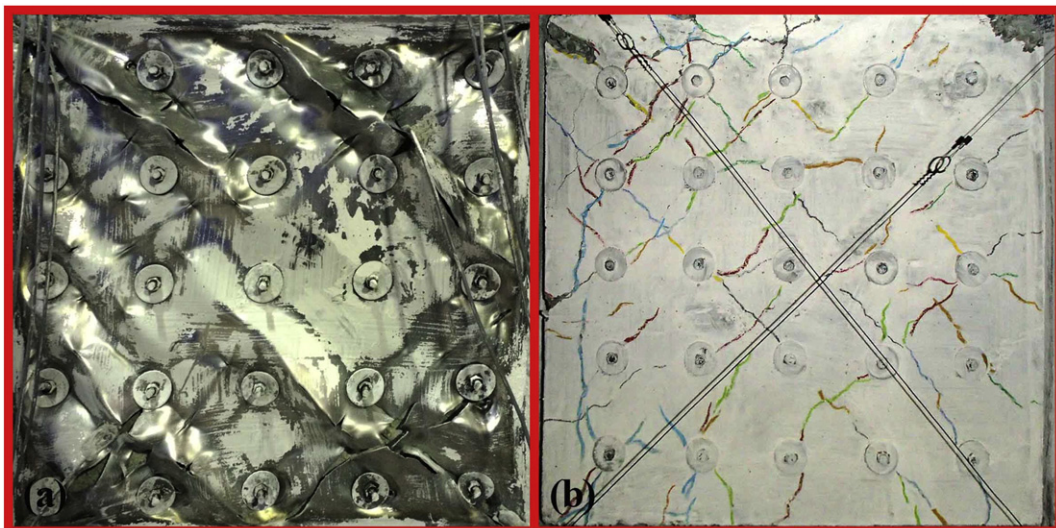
Specimen C<sub>SPSW-N</sub> after the test: (a) the infill steel plate (b) the reinforced concrete panel.
